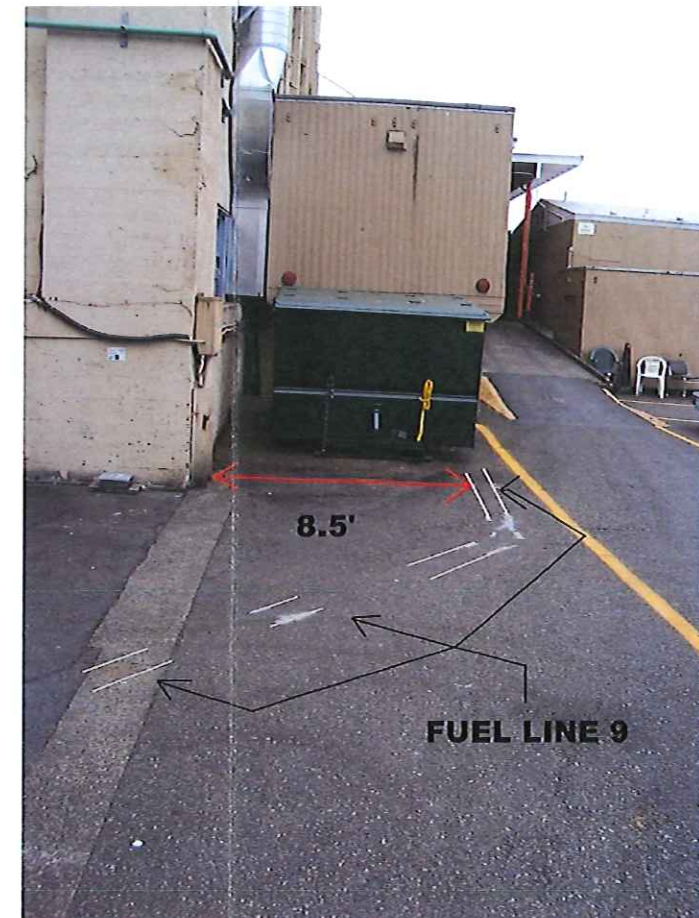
LOOKING SOUTH TOWARDS THE NW CORNER OF BLDG W-39
